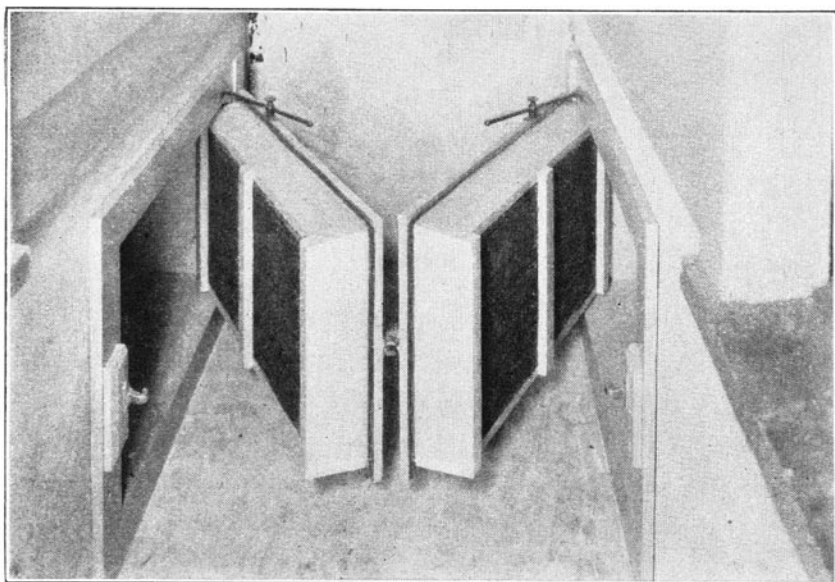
REFRIGERATOR DOORS OPENING INTO BASEMENTS UNDER TEST ROOMS
